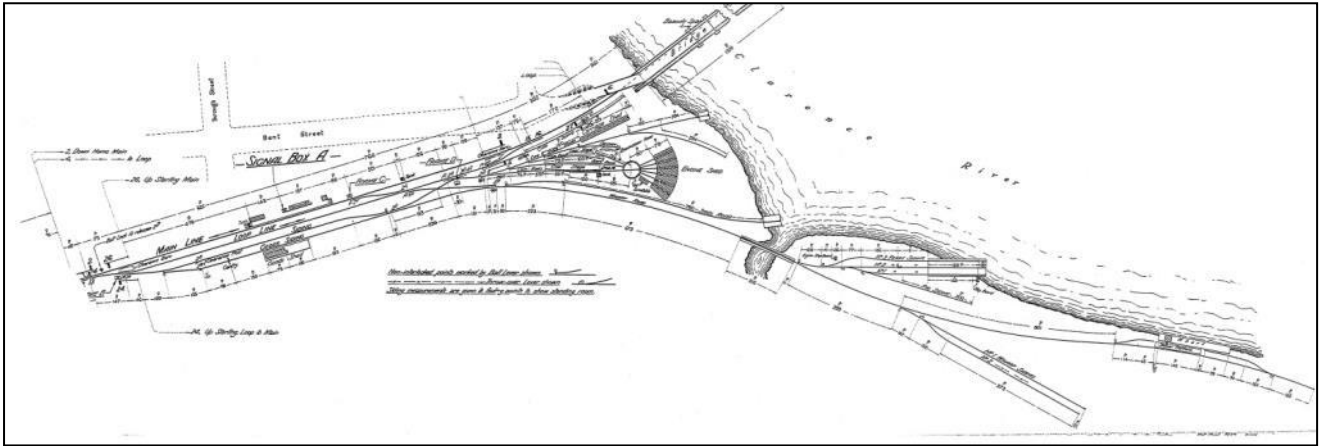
South Grafton in 1932 showing ferry arrangements and the new bridge. Note this is plan is not to scale.
